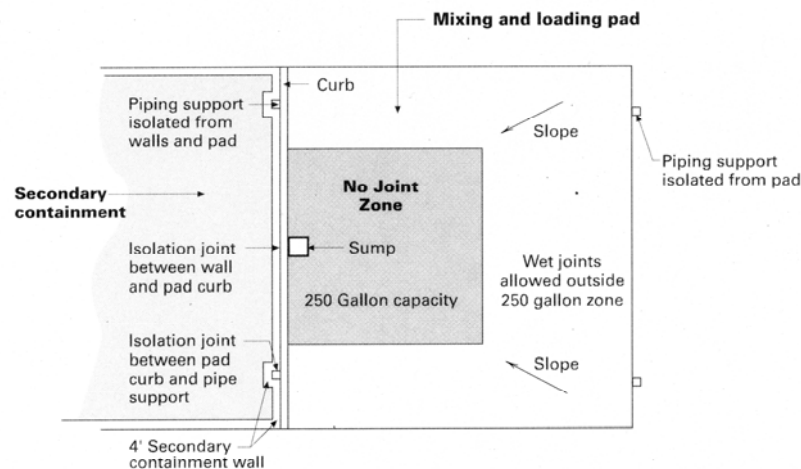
Common Joints in mixing and loading pad (side sump design). Note location of piping support outside mixing and loading pad.
